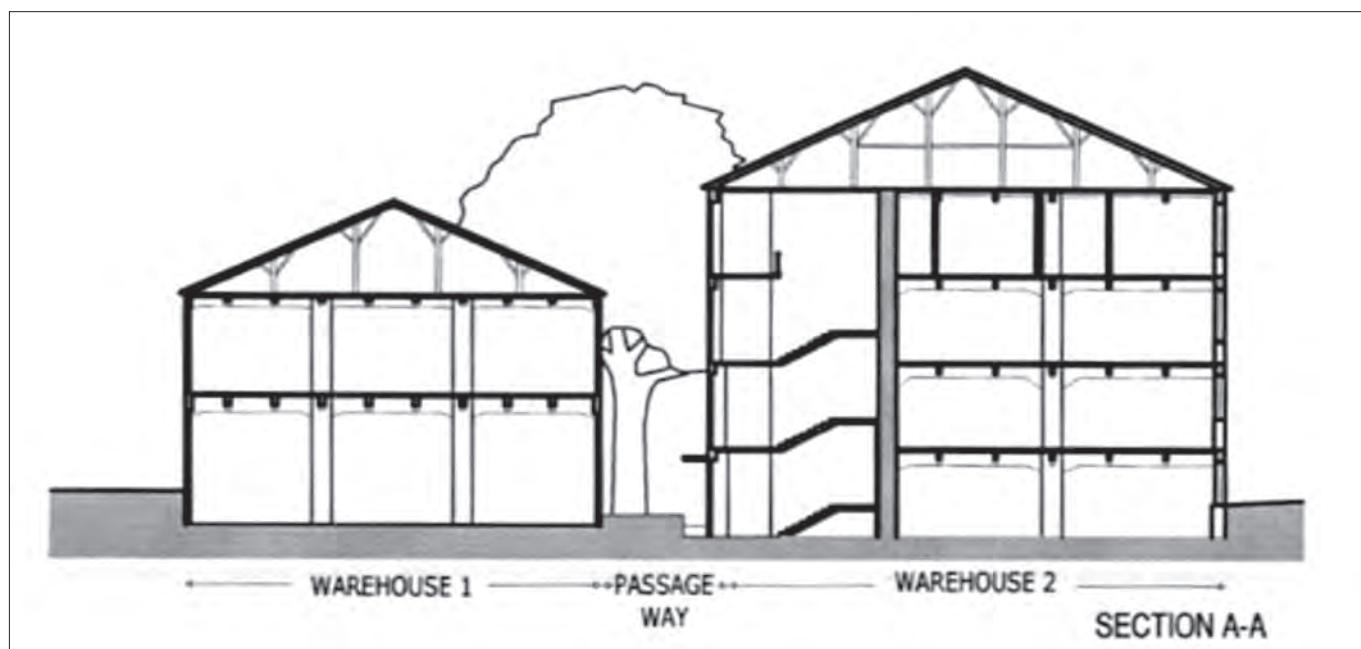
BU Campus, section AA cuts through the two warehouse buildings, showing their spatial arrangements prior to their conversion.
